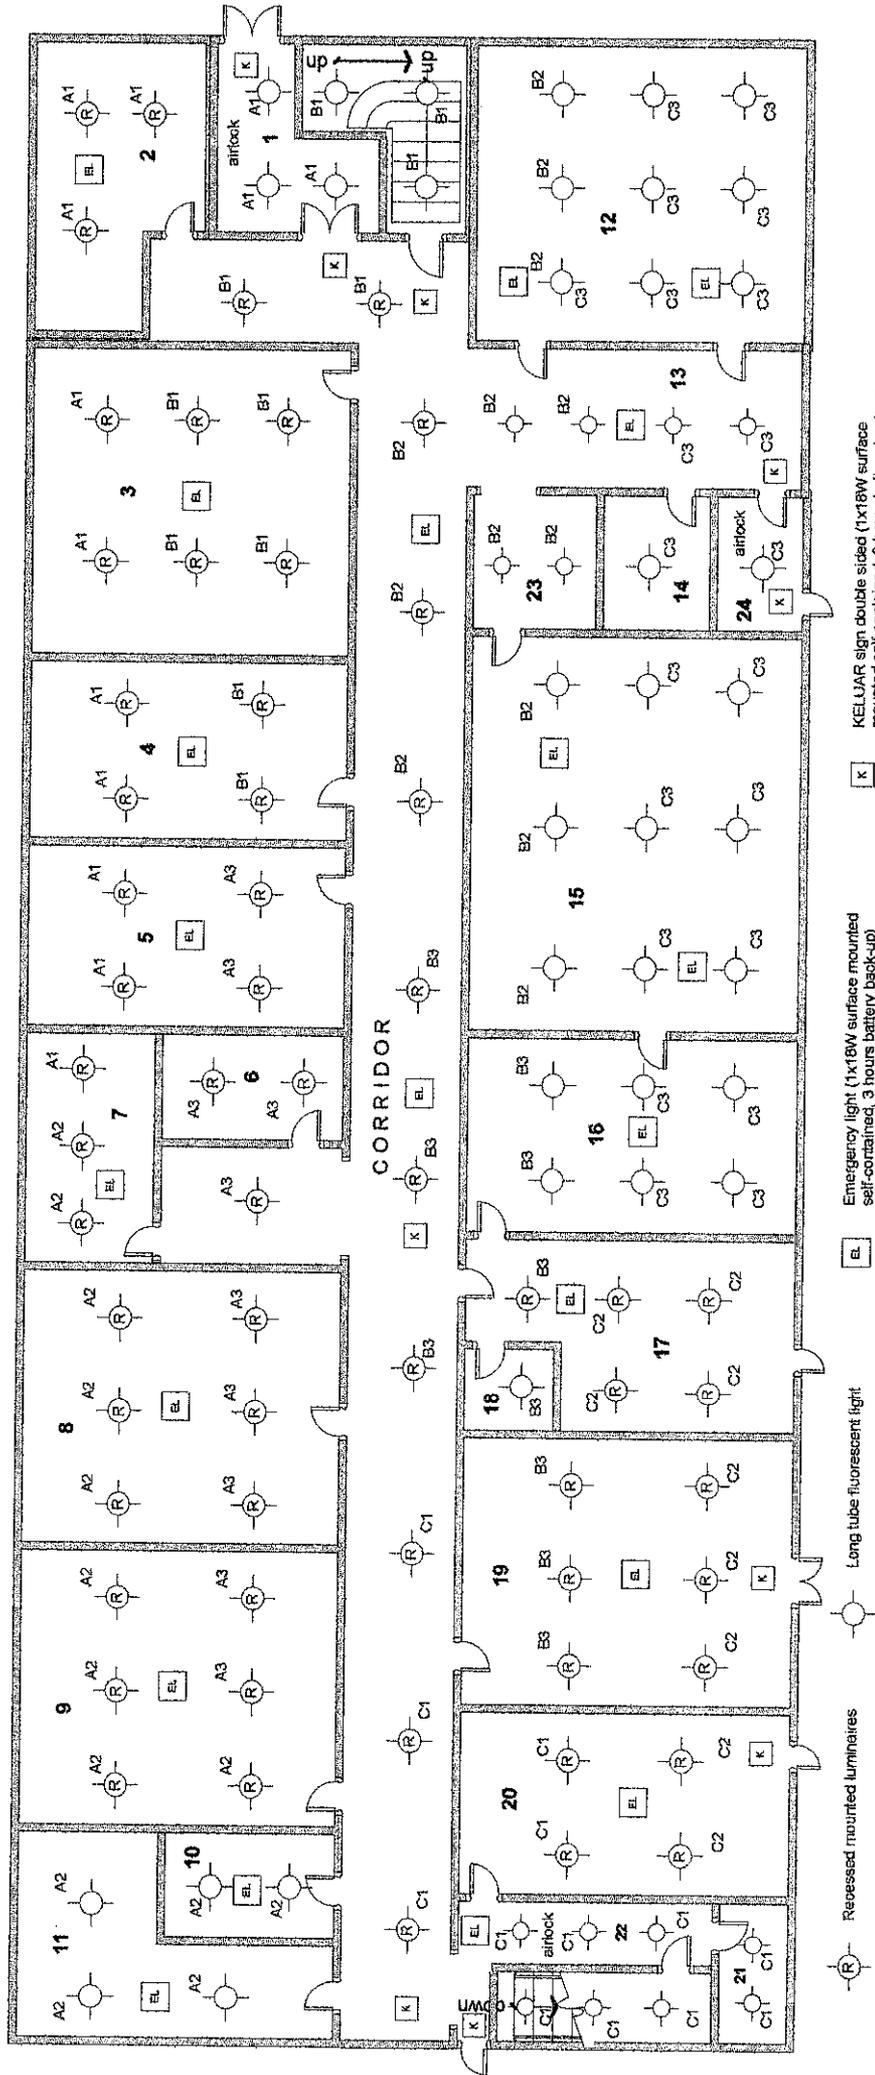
Ground floor of the building with normal lighting and emergency lighting fixtures arrangement.
